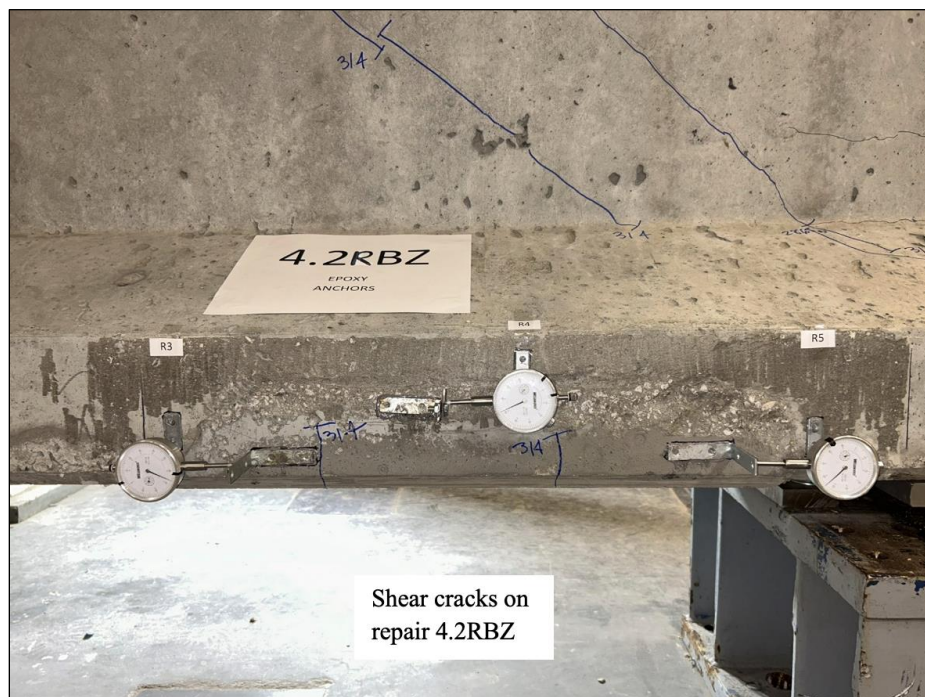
Photo. Test 4.2.S (repair 4.2RBZ, 4.2RTFE, 4.2RTF, 4.2LTF) shear cracks and tension cracking at the base of repair 4.2RBZ at 314 kip (right face of girder pictured).
